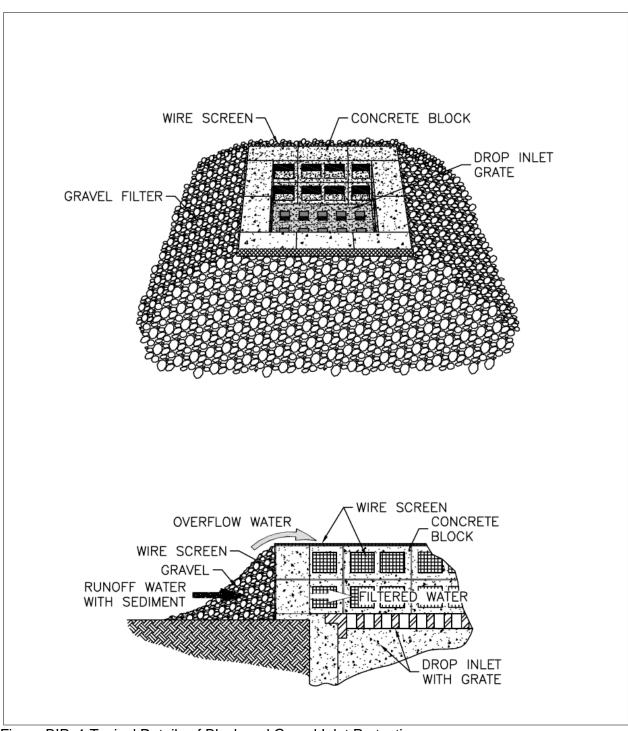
Typical Details of Block and Gravel Inlet Protection
